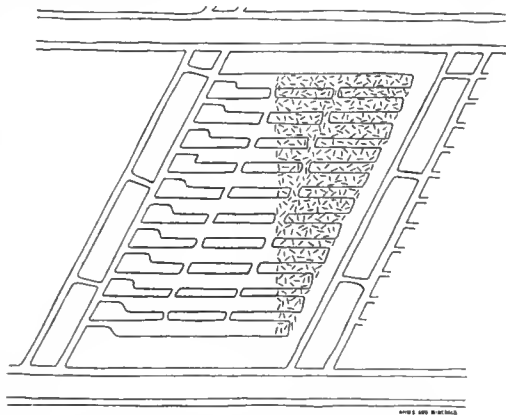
SHOWING FACES OF PILLARS PERPENDICULAR TO THE SIDE
